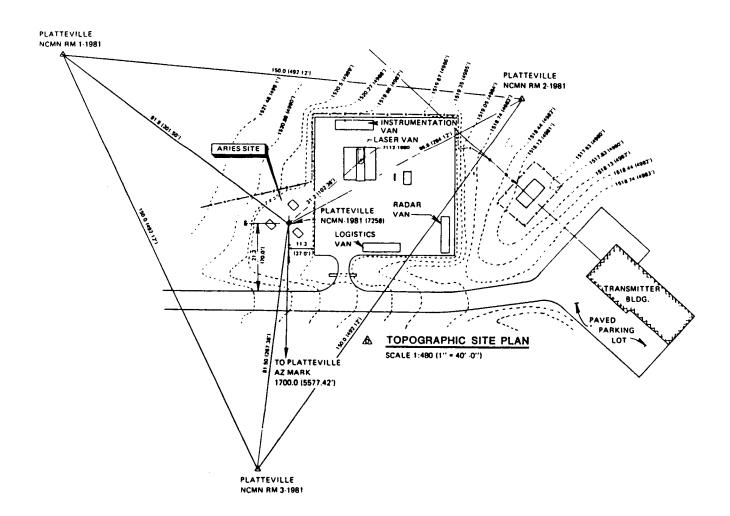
PLATVL. PLATTEVILLE Site Sketch
